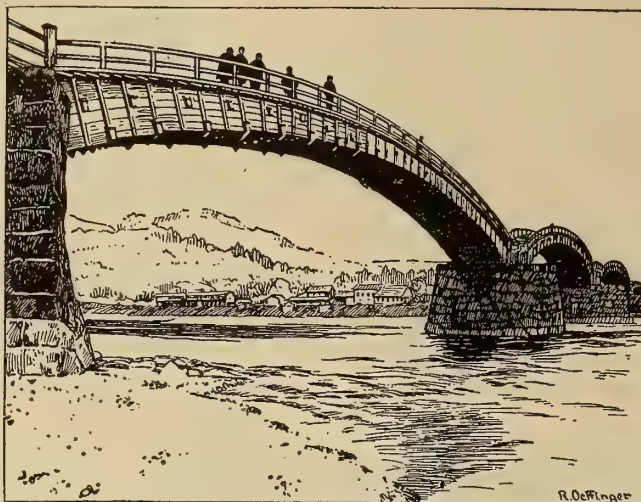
ARCHED BEAM BRIDGE AT OSAKA, JAPAN
